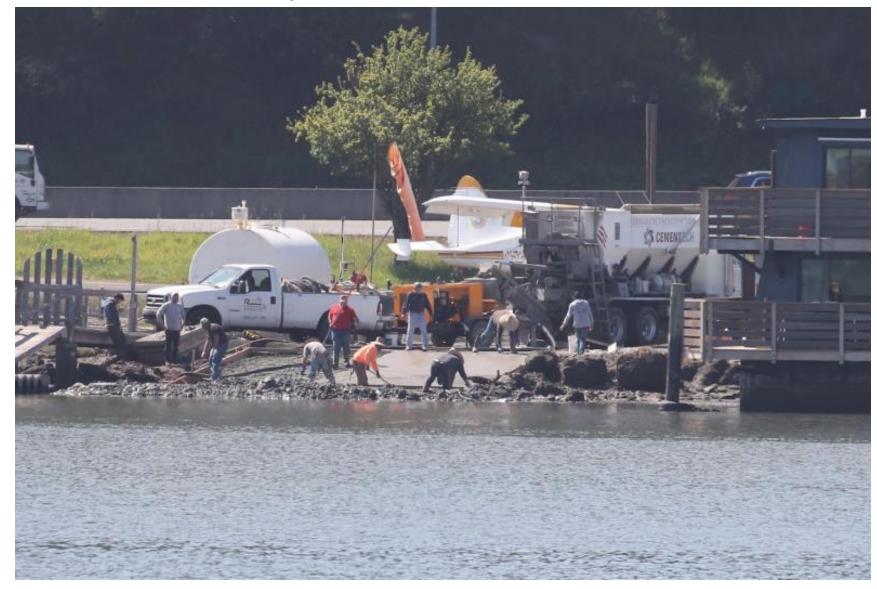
D. April 22, 2022. Staff photograph depicting completed water access ramp.
